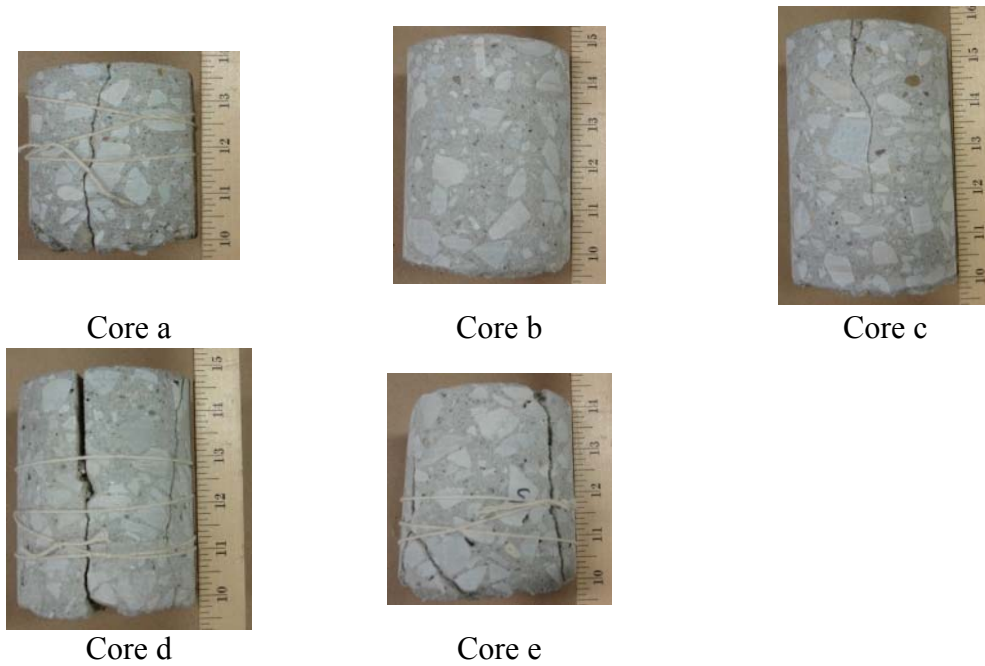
North Riverside Drive pavement cracks and core samples taken at cracks as of March 2009
